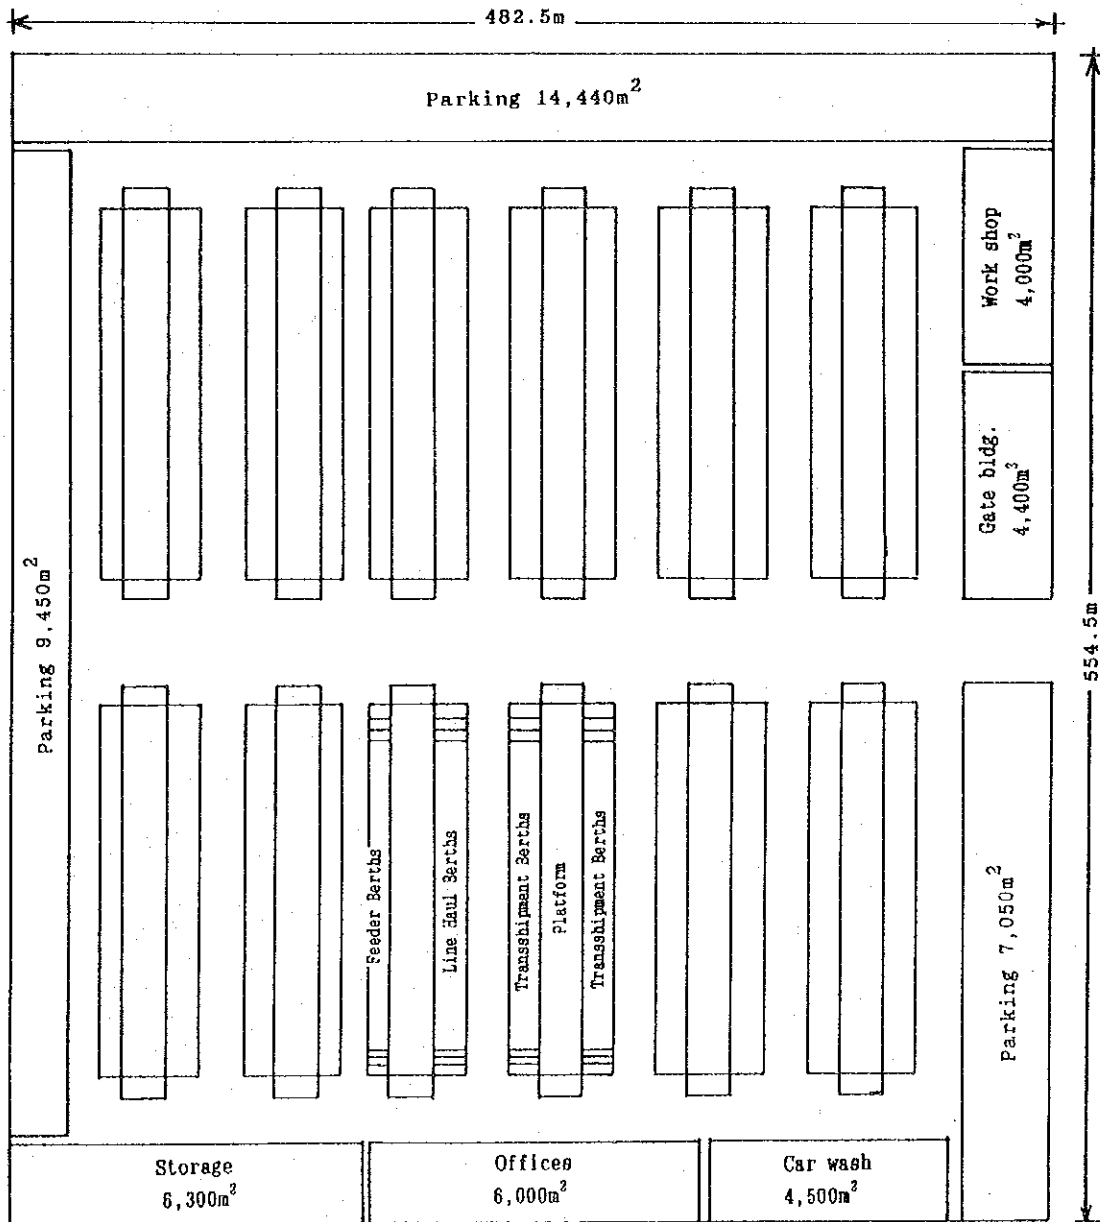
Cairo Truck Terminal Schematic Layout
